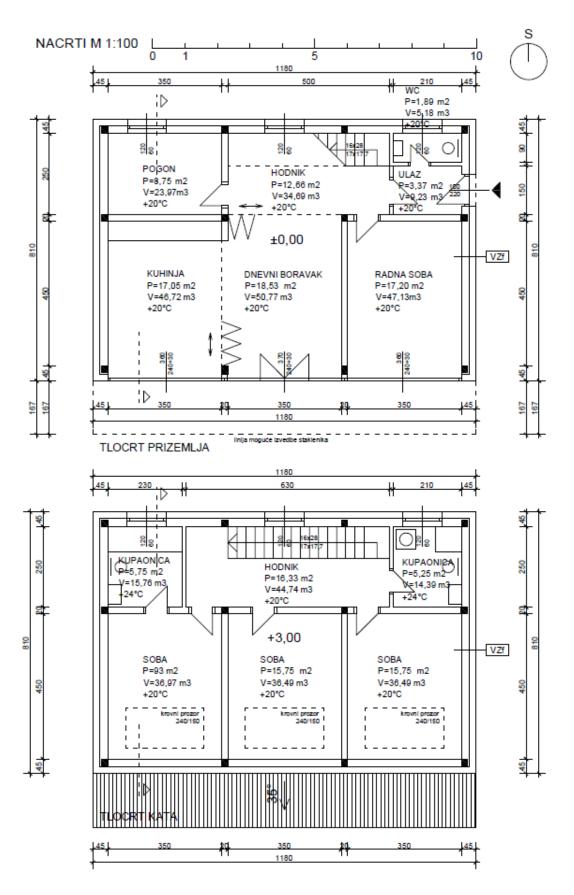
Floor plans - GROUND FLOOR and UPPER FLOOR
